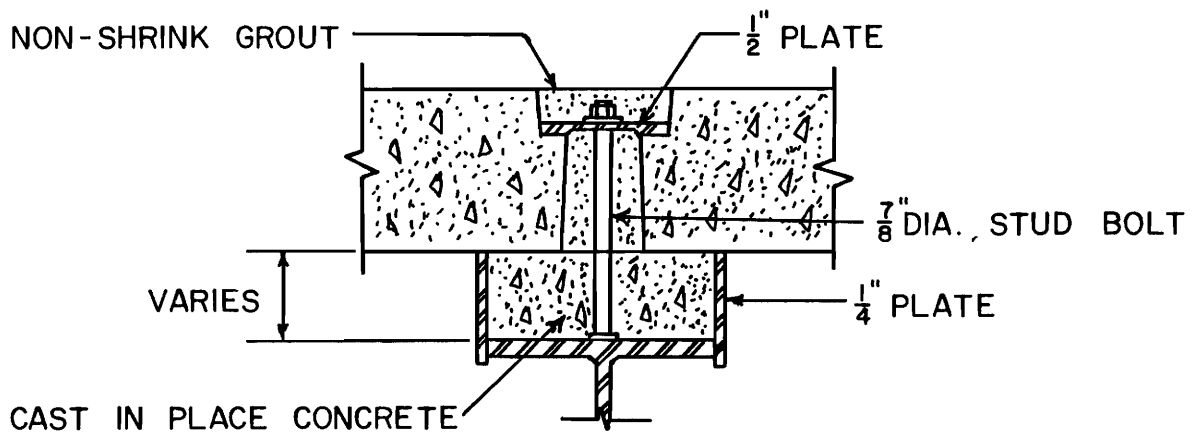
Erie County Bridge Deck Connection Details, New York.
